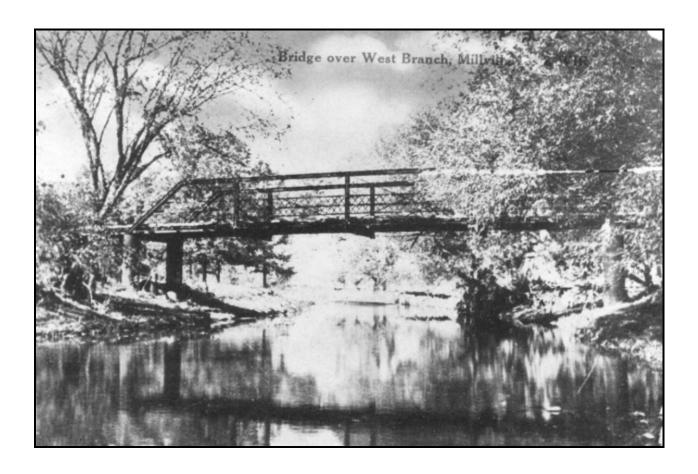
An undated postcard of the Pratt pony-truss bridge over the main branch of the Apple River (designated above as the "West Branch") at Millville, looking north. This bridge was of the same design as the one spanning the South Fork and presumably was contemporary with the latter (ARCSP photograph collection).
